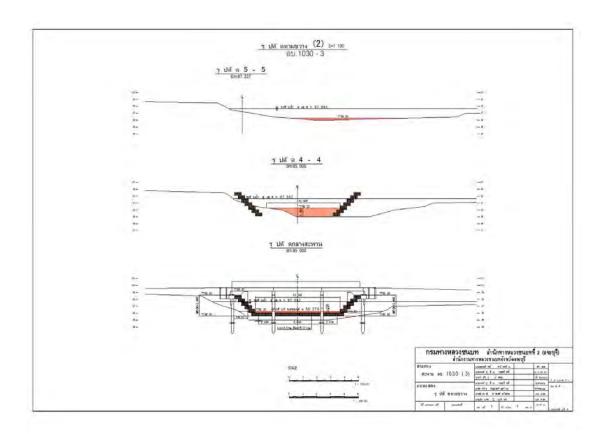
Design drawing of rehabilitation plan (Bridge1030-3)
